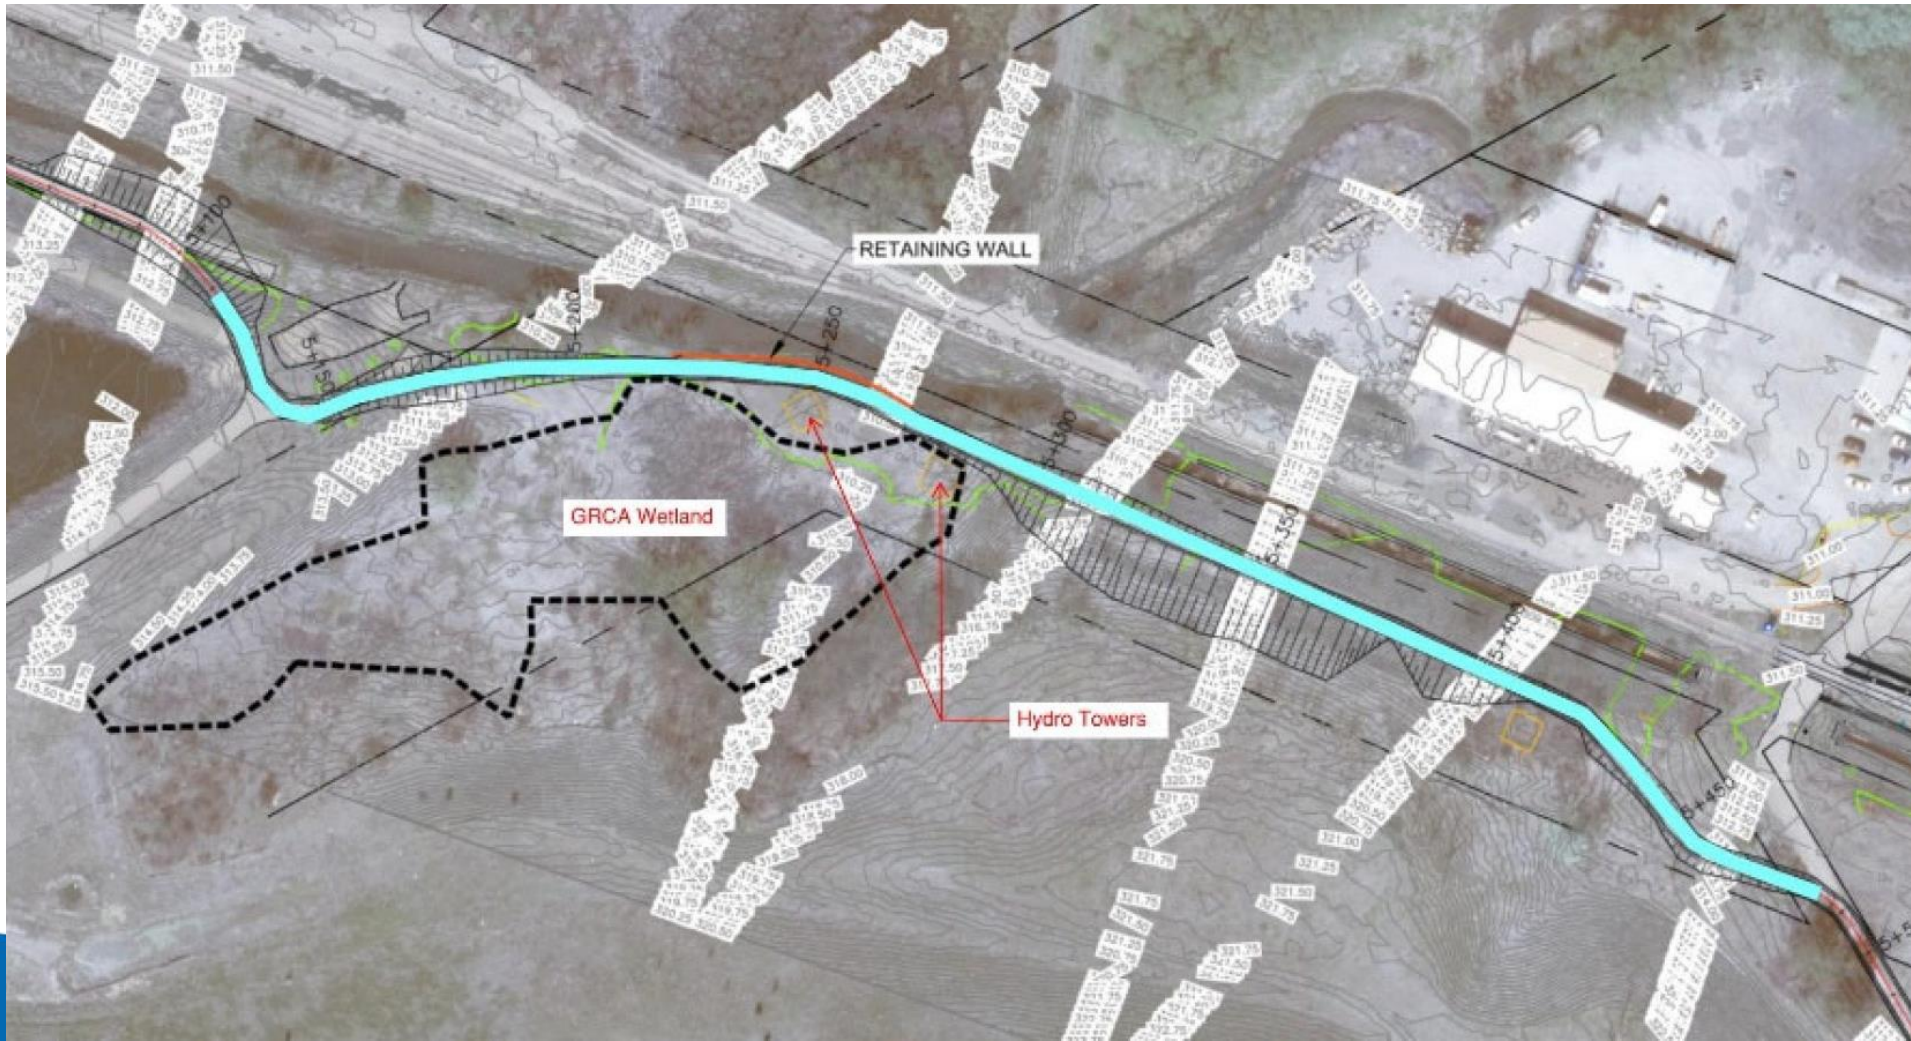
Proposed alignment of Schneider's Creek MUT within Hydro One Corridor.
